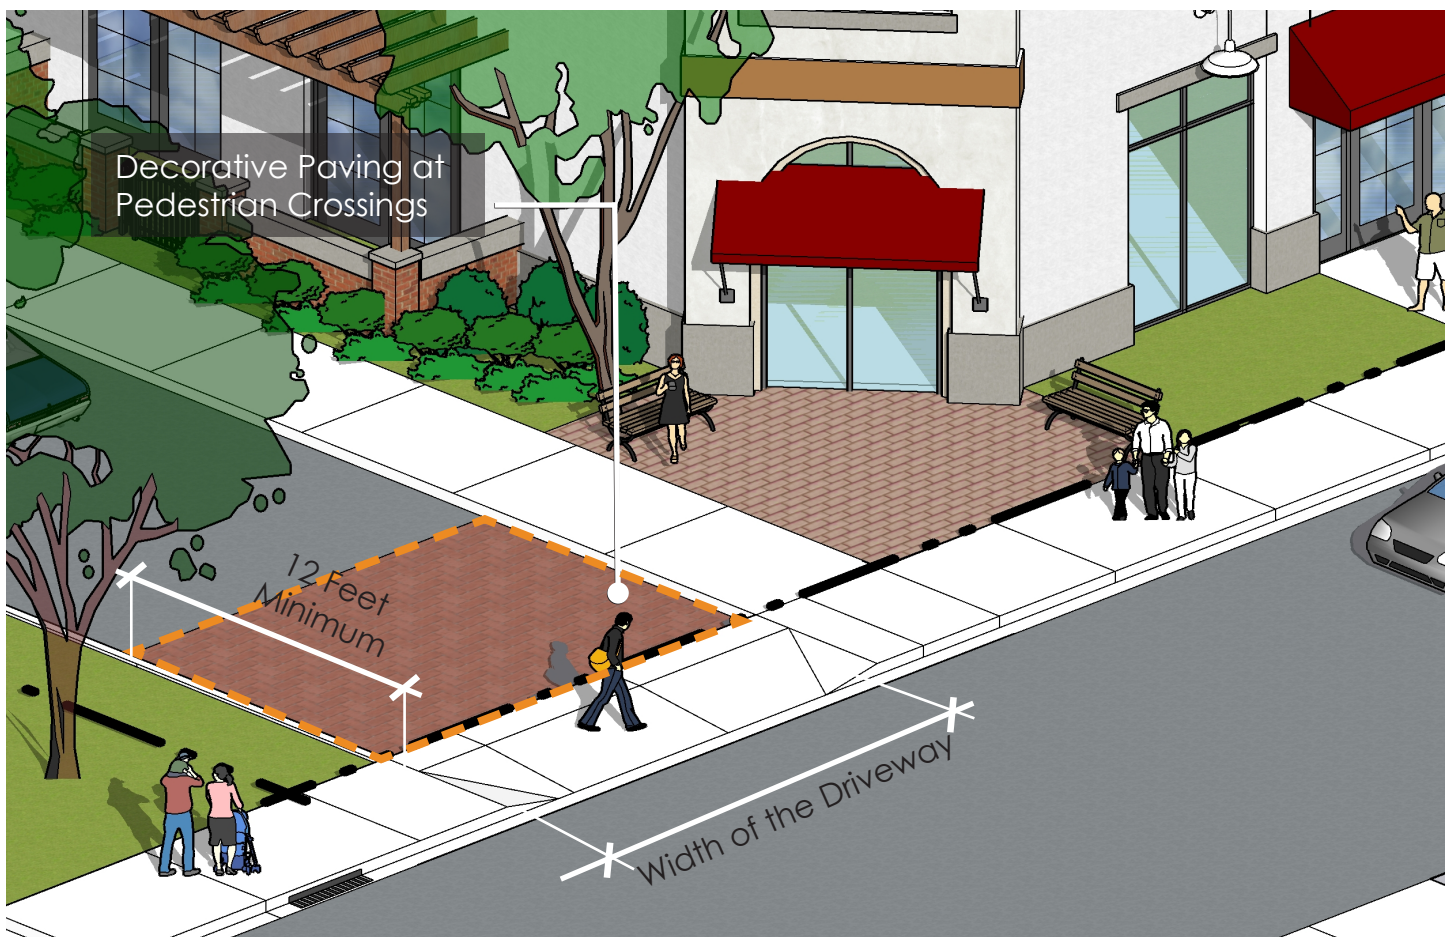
Enhanced paving treatments shall be provided for entry driveways (2.B.3.c)
